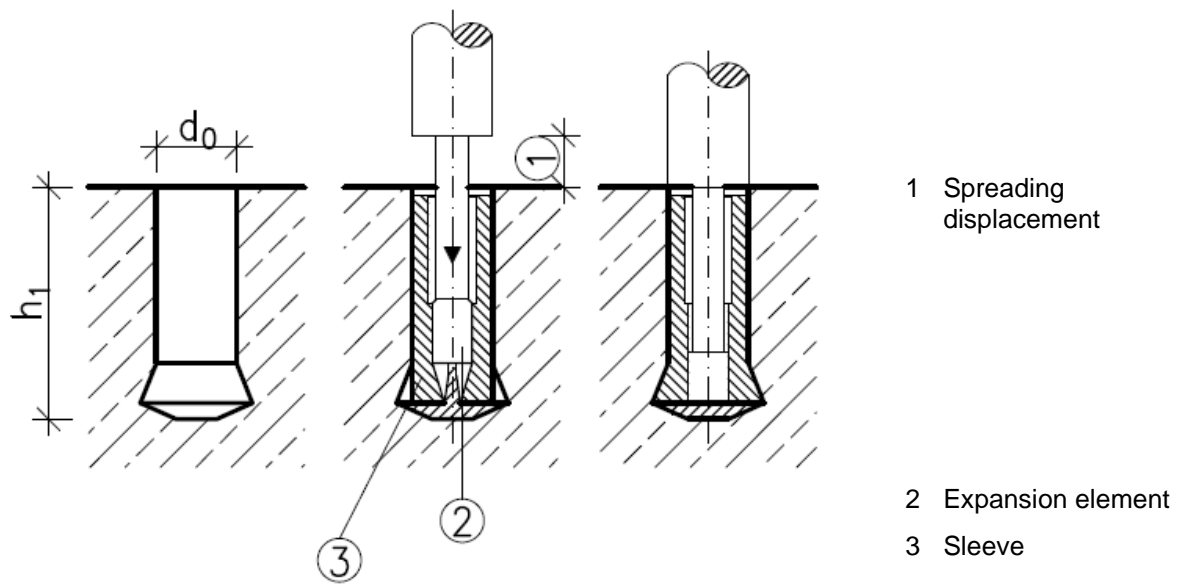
Fastener installation by hammering the expansion element (cone) into the fastener sleeve
